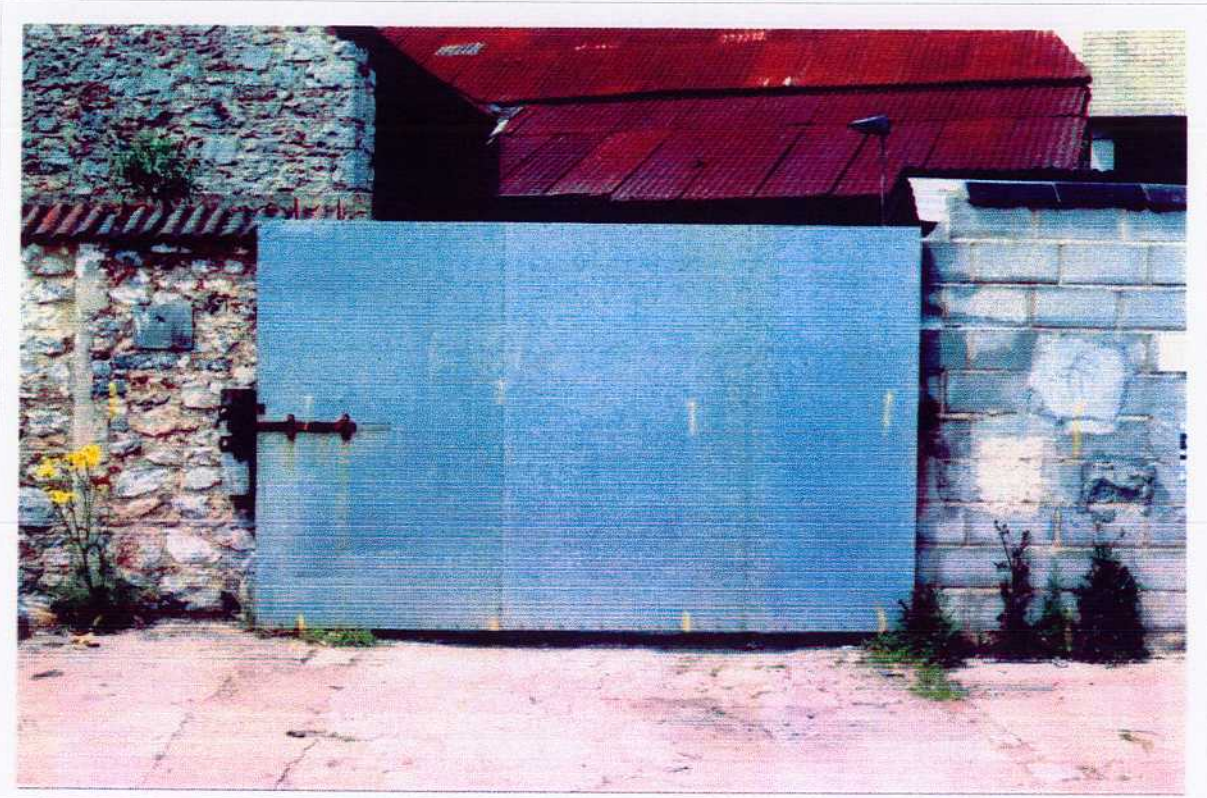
Structure 2. Northern wall, south-facing elevation. Gateway.
